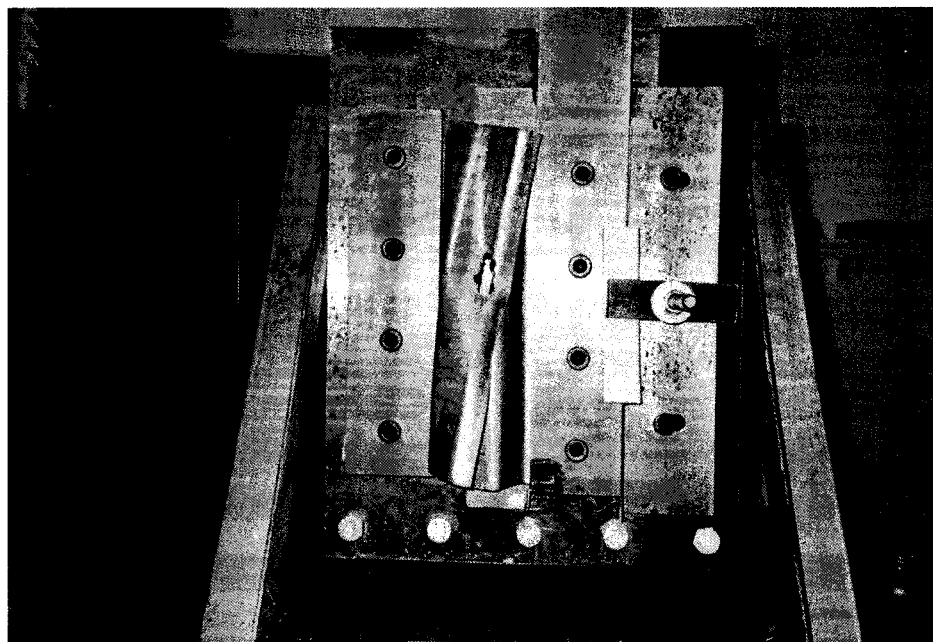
Slot welded connection specimen deformed by shear
